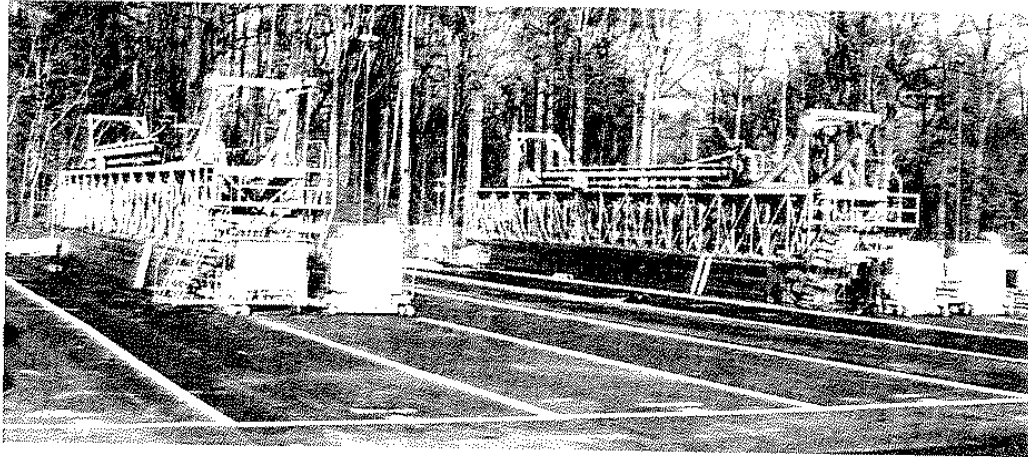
The FHWA two ALF machines loading pavements at PTF site.
